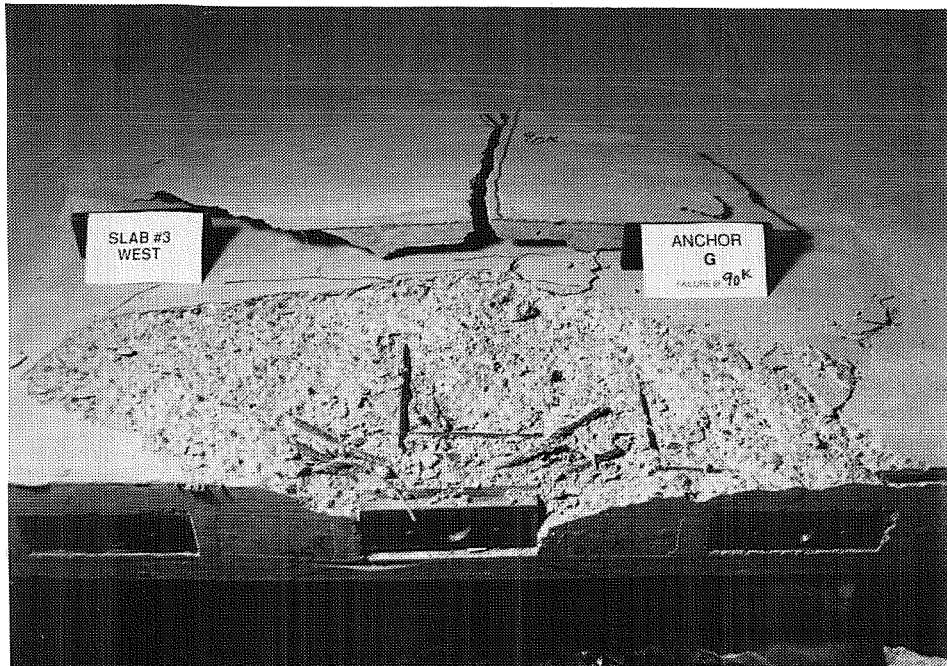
Crushing Failure of Slab Anchorage (from [17])
